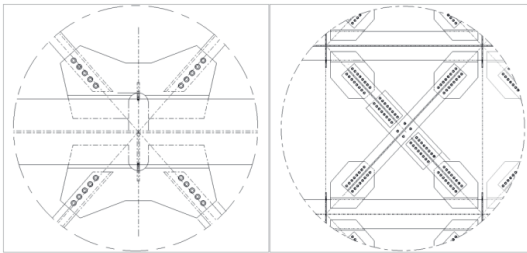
Left: Detail of the connection for the top lateral bracings. Right: Detail of the connection for the bottom lateral bracing.
